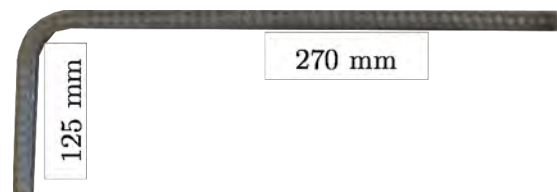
Hand-bent Y12 rebar at grouted connection
